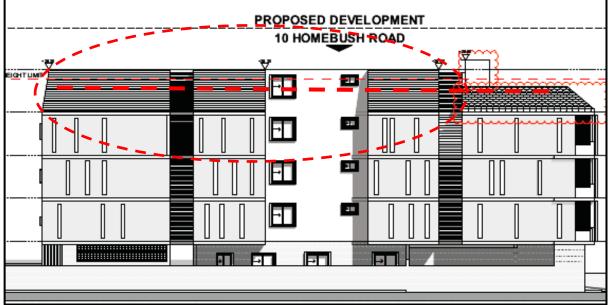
View of the southern elevation noting the extent of the proposed building height variation.
